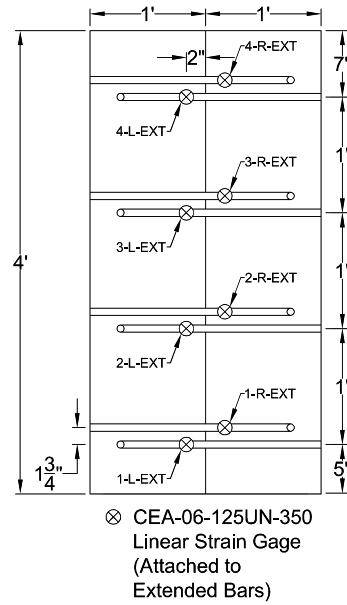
Plan View of Strain Gages 6 in. Above Bottom of Precast (Extended Bar Only)
